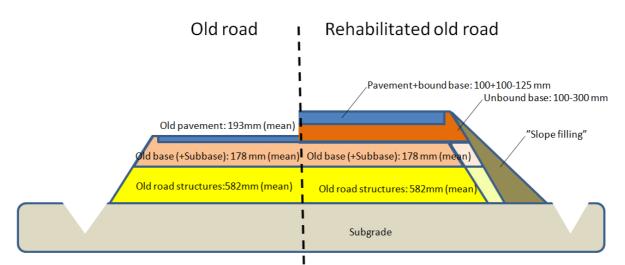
Strengthening structure for risk class section 4 in road section 505.
